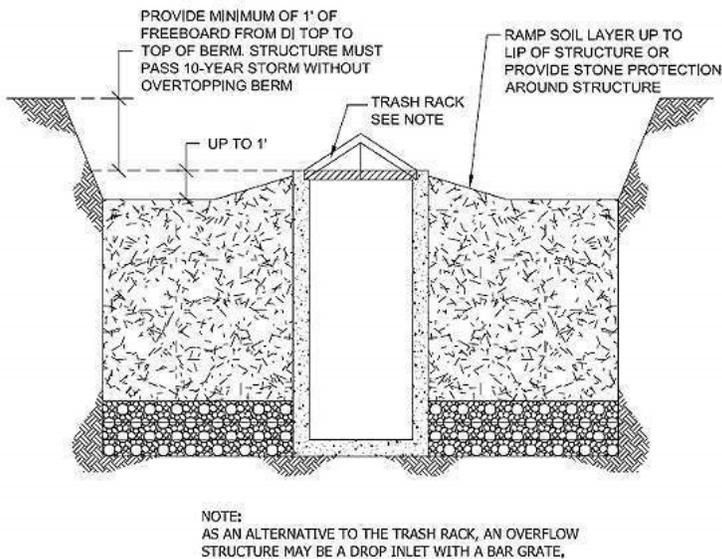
Typical Detail of how to prevent bypass or short-circuiting around the overflow structure
